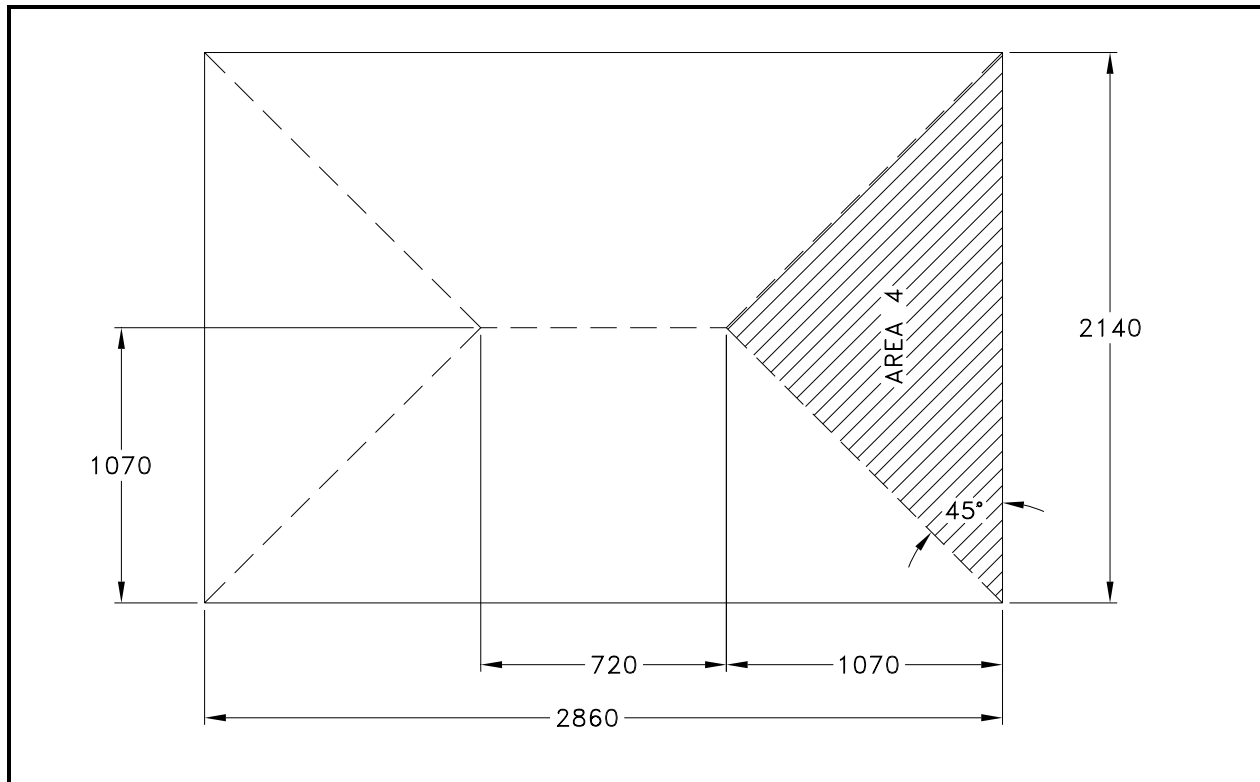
(e) – View of Area 4 on Side Wall Used to Calculate Edge Load on Rear Wall
